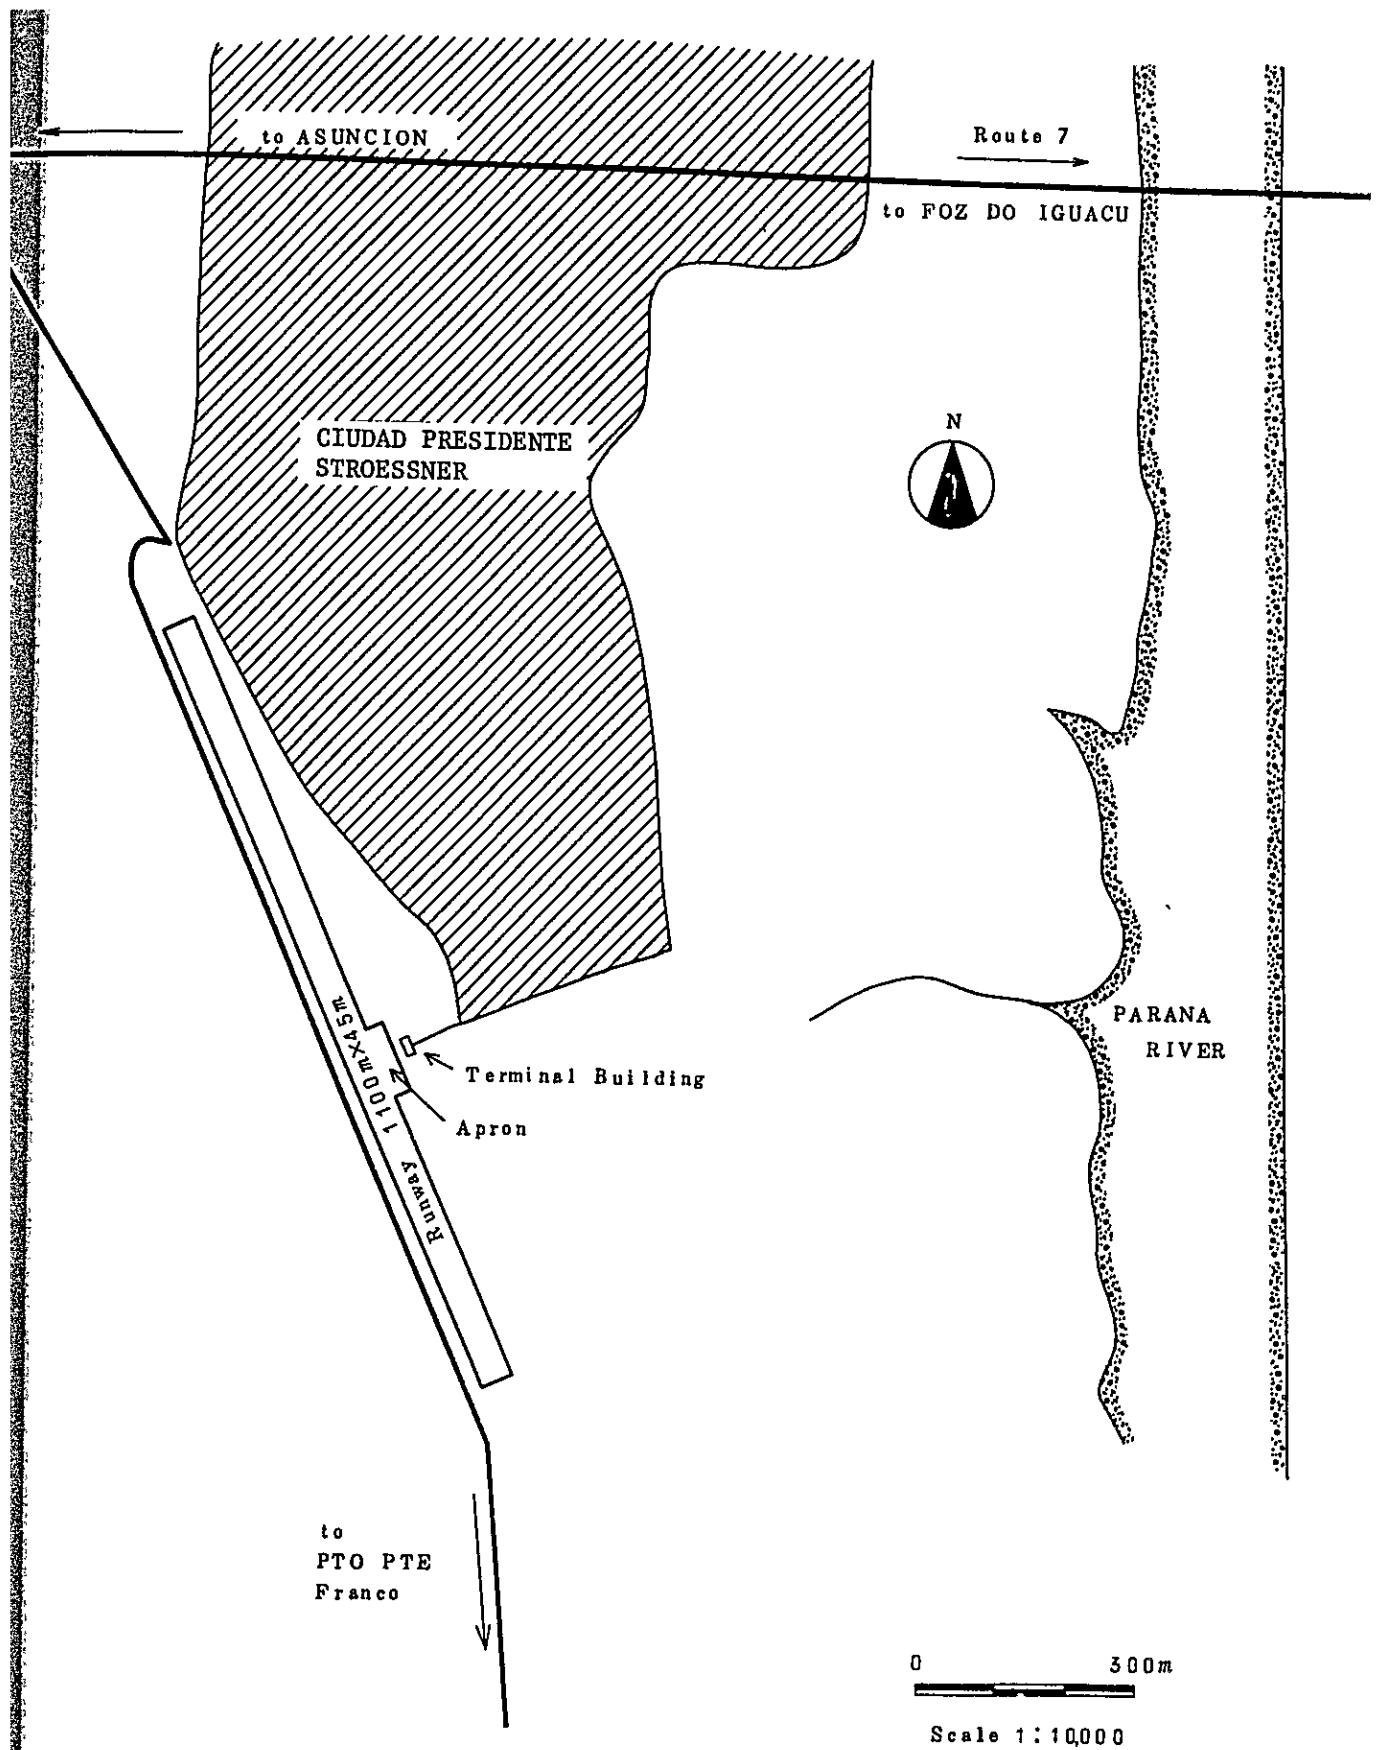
EXISTING CPS AIRPORT LAYOUT
